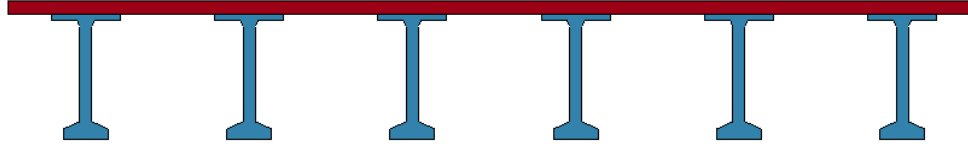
Cross-Sectional View of Archetype 4 Bridge Model.
